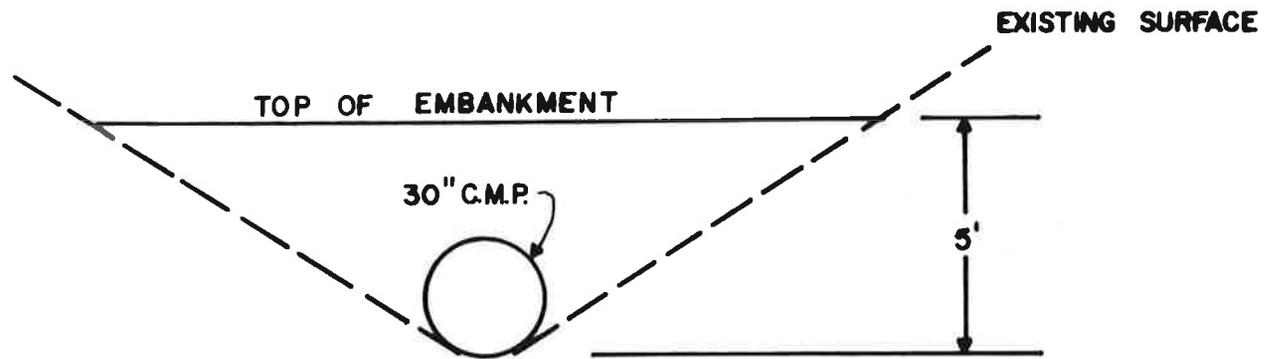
TYPICAL CHANNEL CROSS SECTION
